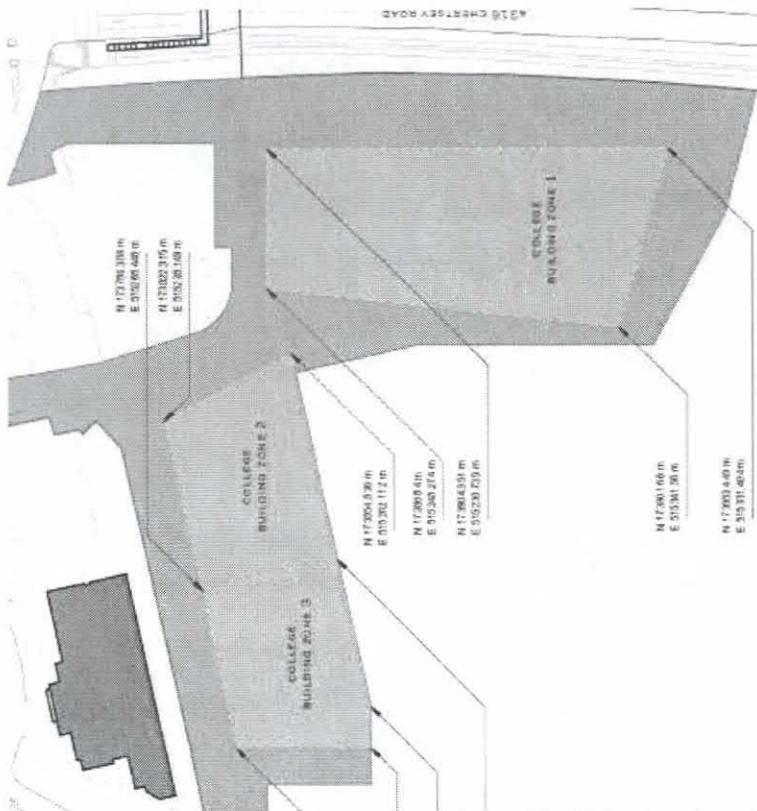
Extract from Parameter Plan PL-07A showing location of Building Zones within the College Development Zone.
